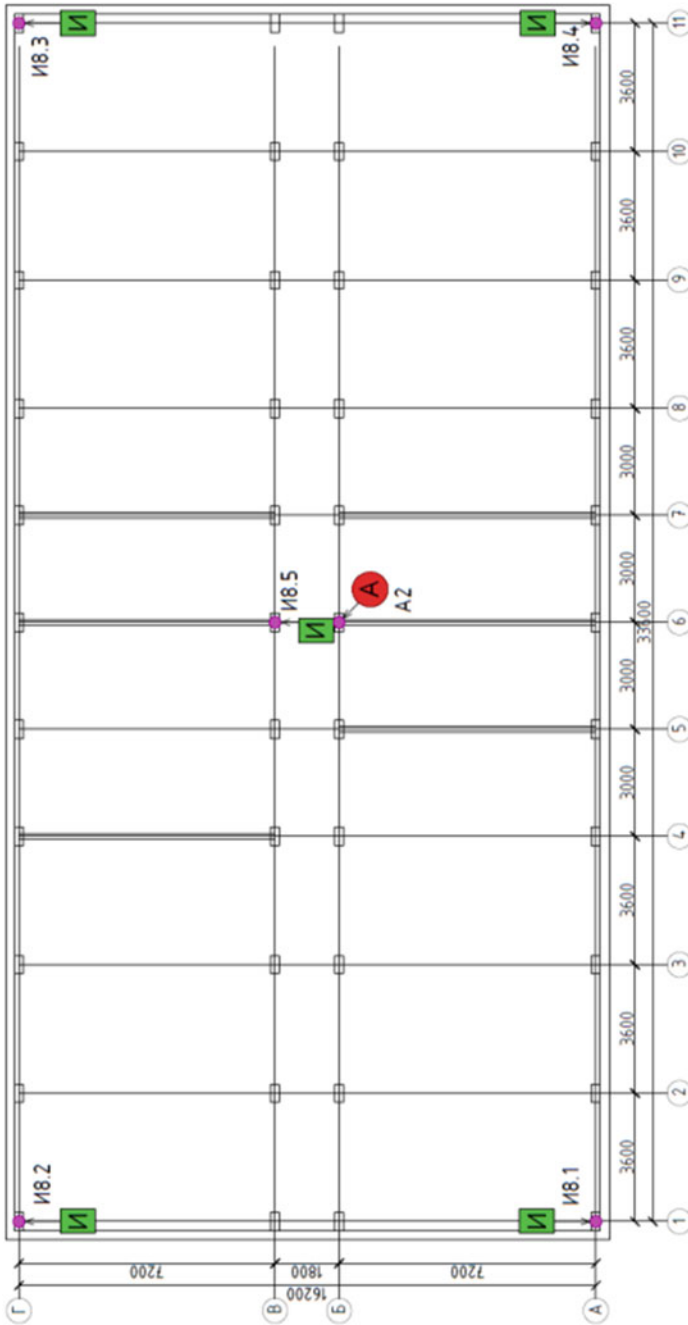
Layout of monitoring sensors at elev. +16,240 frame building
